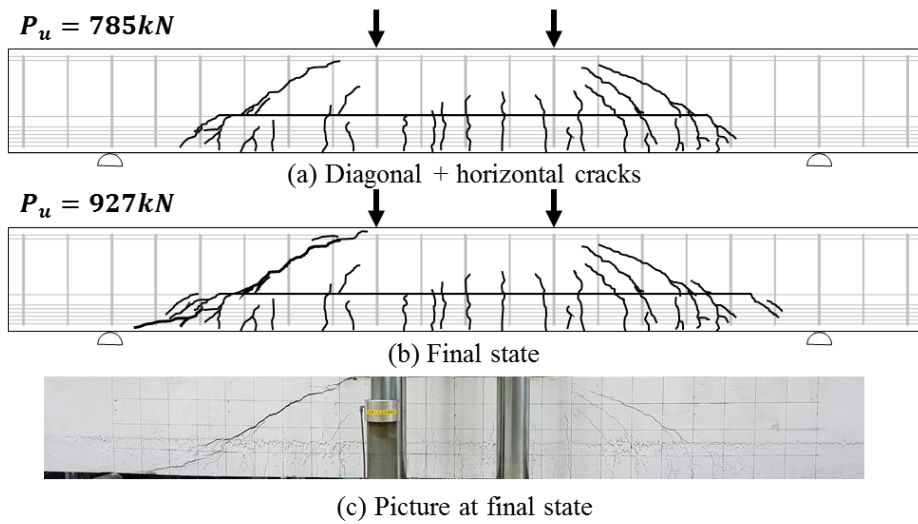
Failure mode and crack pattern of RC-S5 specimen
